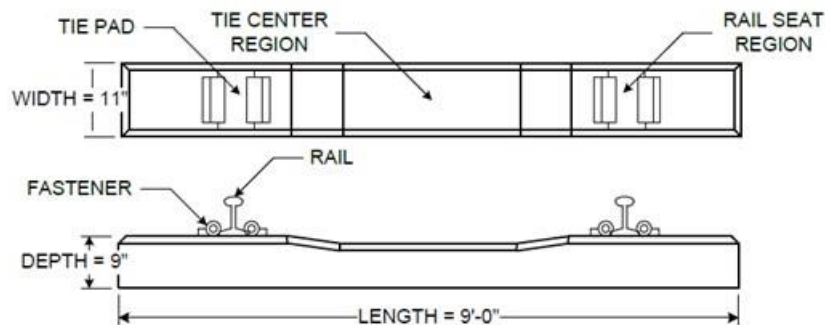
Typical prestressed concrete tie shape and dimension (Lutch, 2009) (1 inch=25.4 mm)
